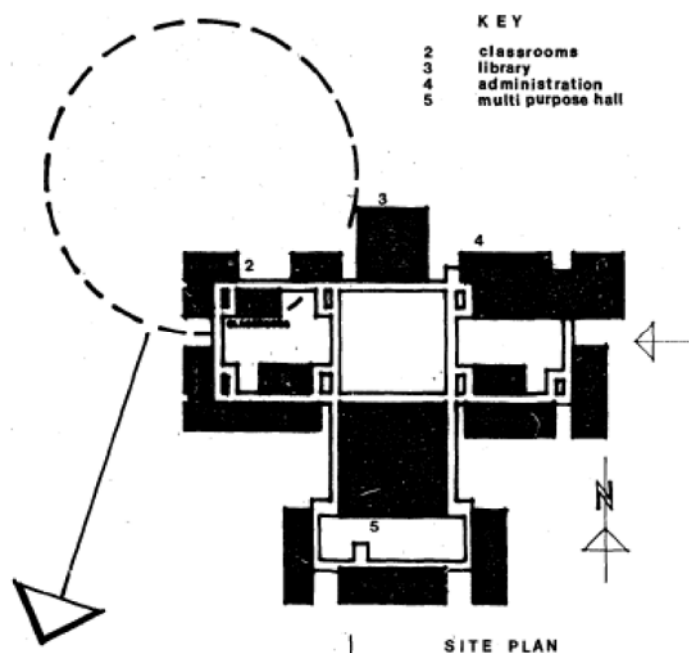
Standard plan of a Study 3 school at Evans High School, Blacktown. *Source:* Russell Jack, Volume 2 in Tanner Denton Kibble Architects 2018, 137.
